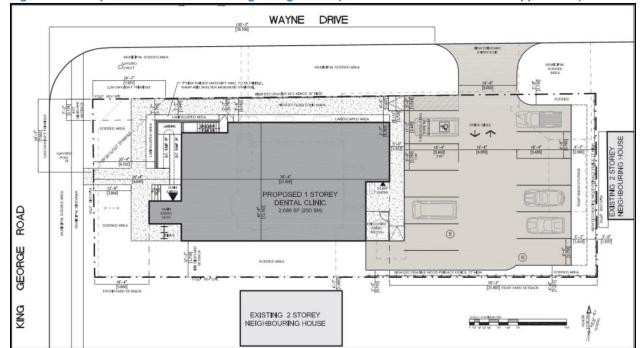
Conceptual Site Plan for 128 King George Road (full-scale version attached as Appendix A)
